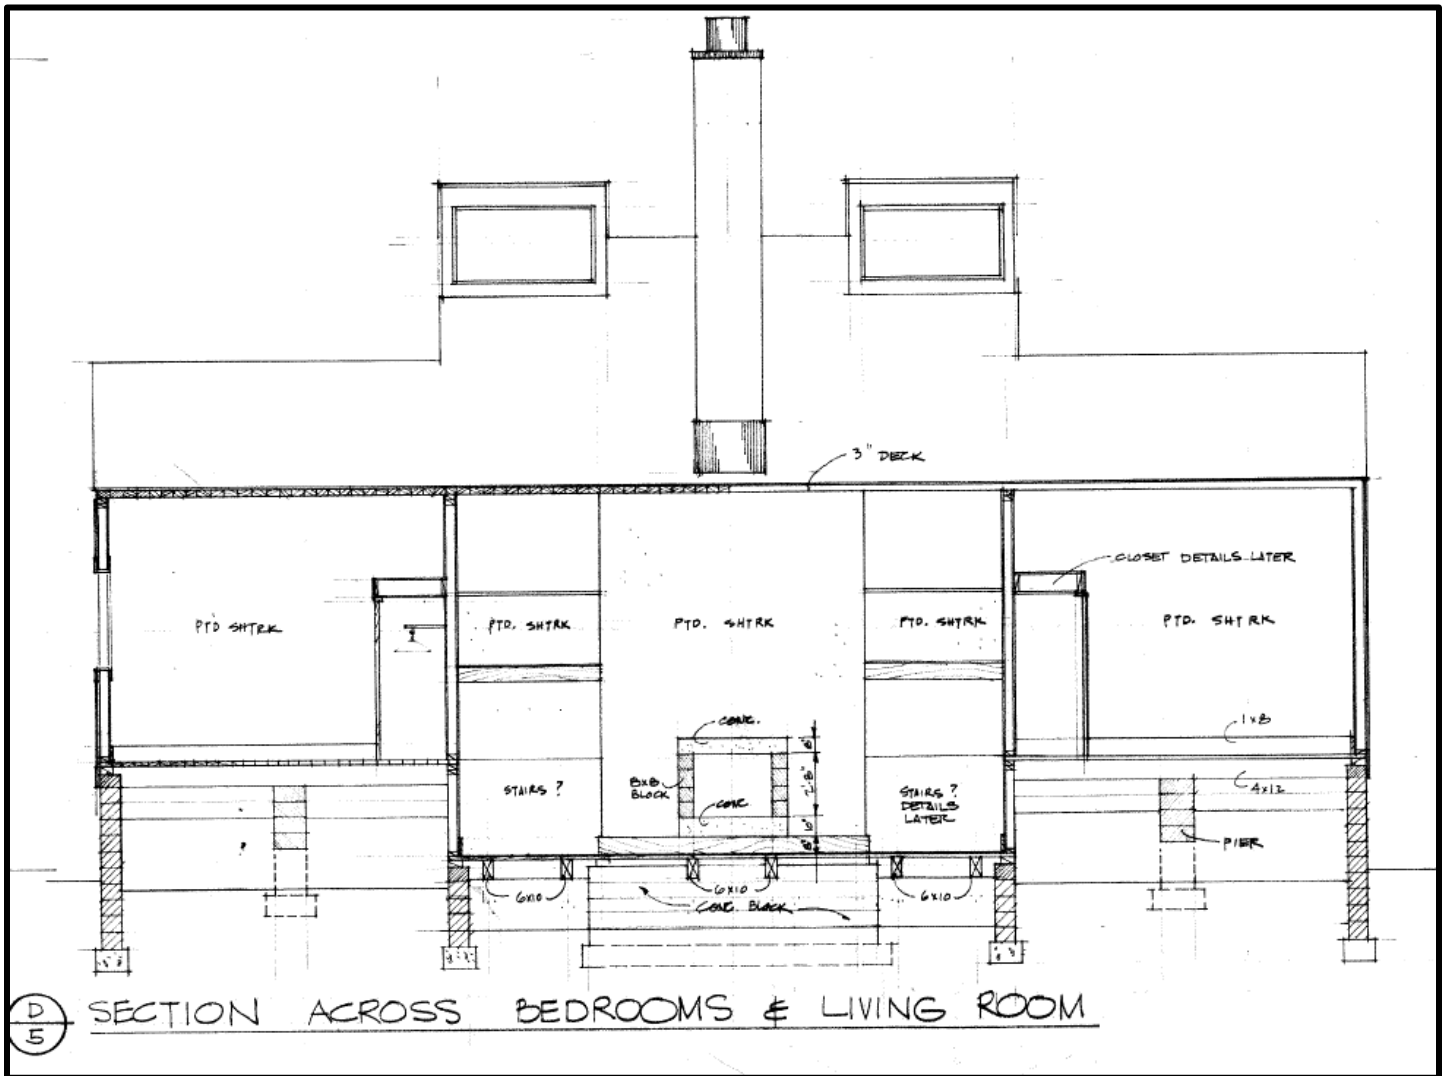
Section Across Bedrooms and Living Room, Guest House (Architect's drawings, 1962).
